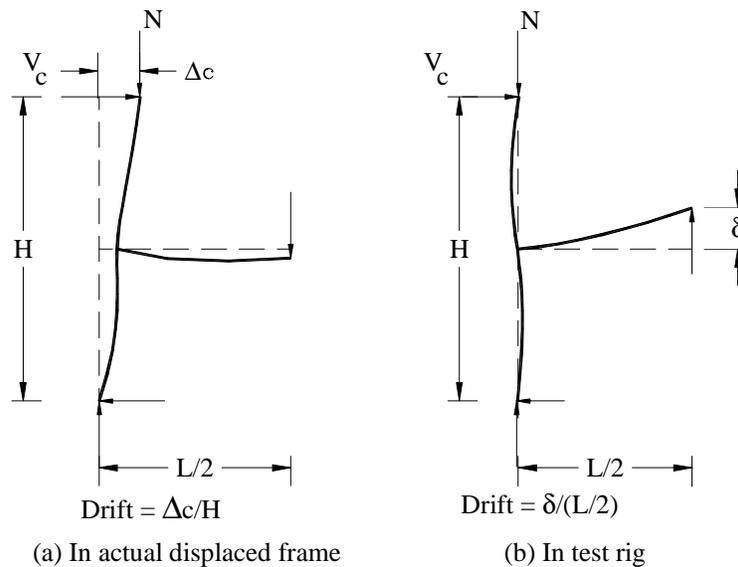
Exterior beam-column subassemblages in (a) displaced frame and (b) test rig.
